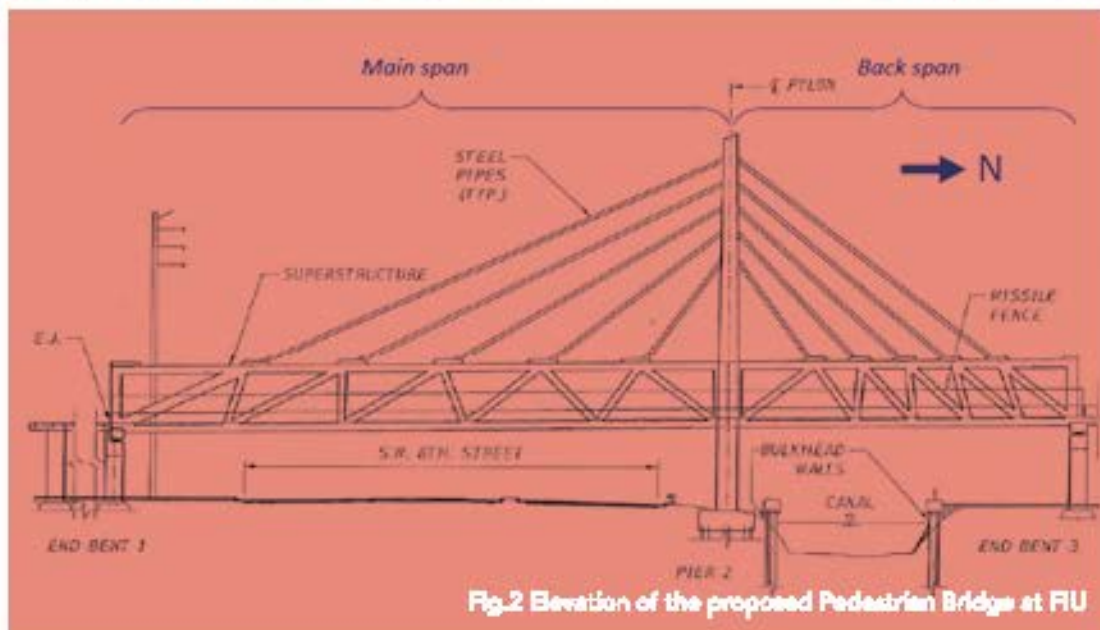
Elevation of the proposed Pedestrian Bridge at FIU
